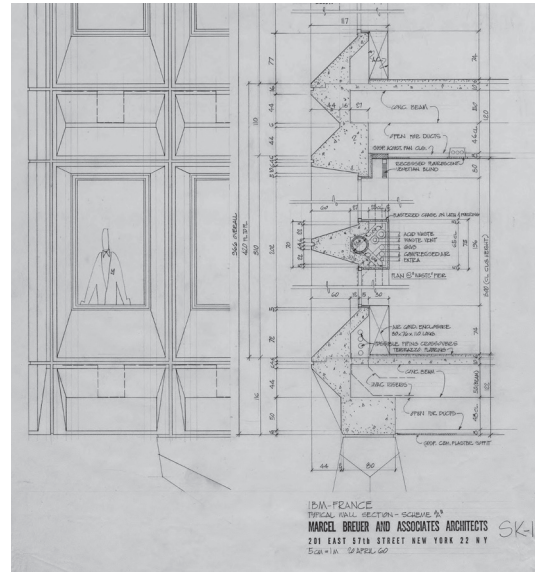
Exterior wall elevation and section, IBM Research Center, La Gaudie, France, 1960-04-20. The outline of the beam on the elevation showed the beam's original location. (Syracuse University Library 1960)
